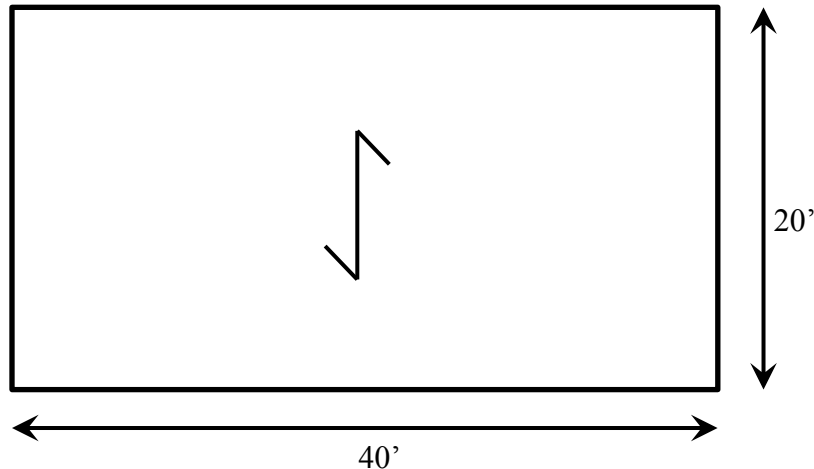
shows the typical be studied to perform the structural impact (structural breadth) on the building.
